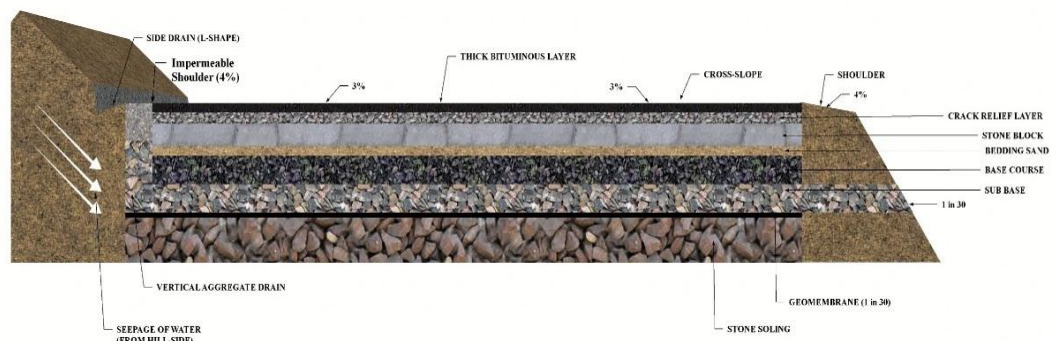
Typical cross section of Heavy Traffic road for moisture induced failure at the subgrade soil
